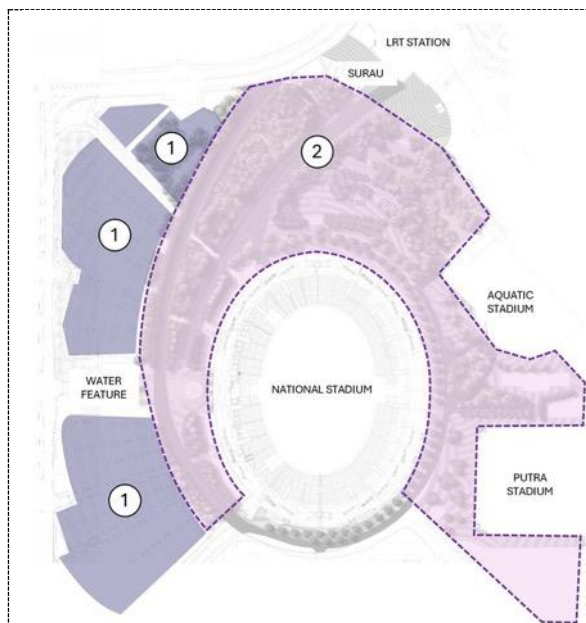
Car parking zones. (1) Outdoor car parking, (2) Underground and multi-storey car parking
